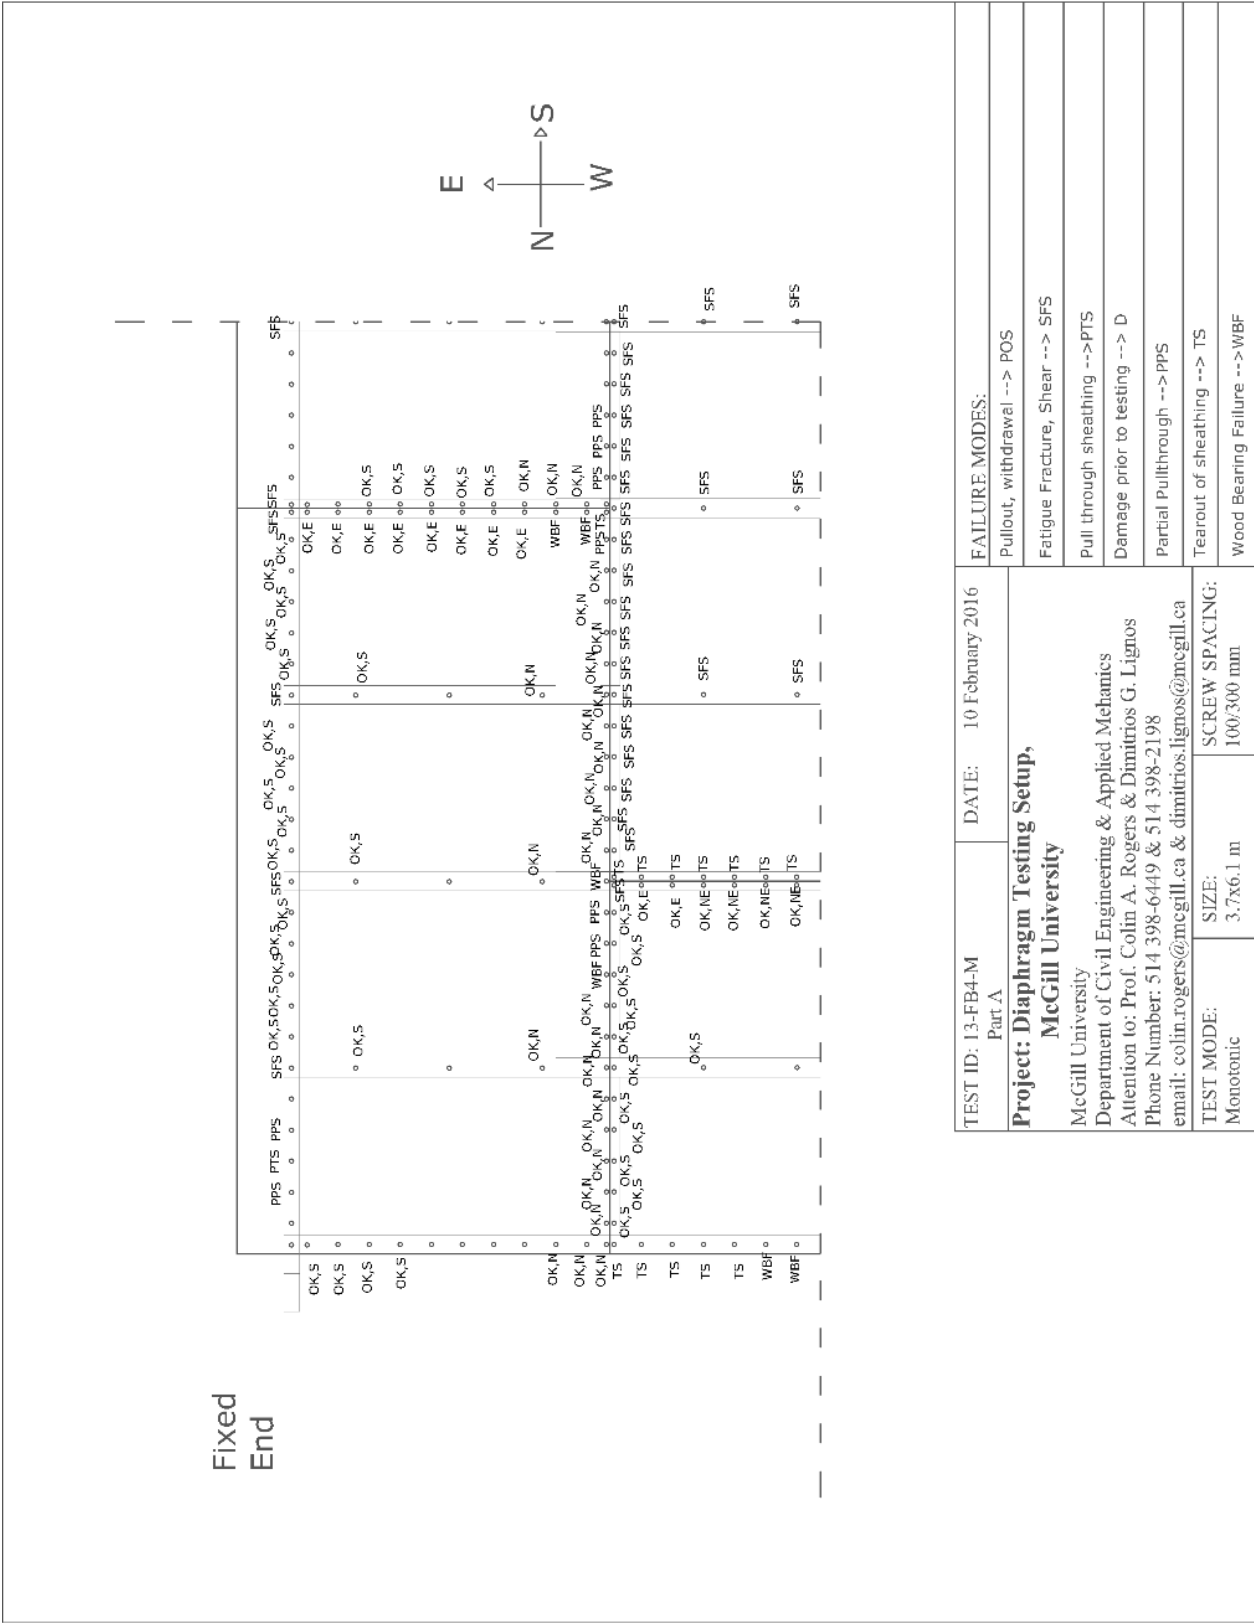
Sheathing Fastener Failure Modes Part A Specimen 13-FB4-M
